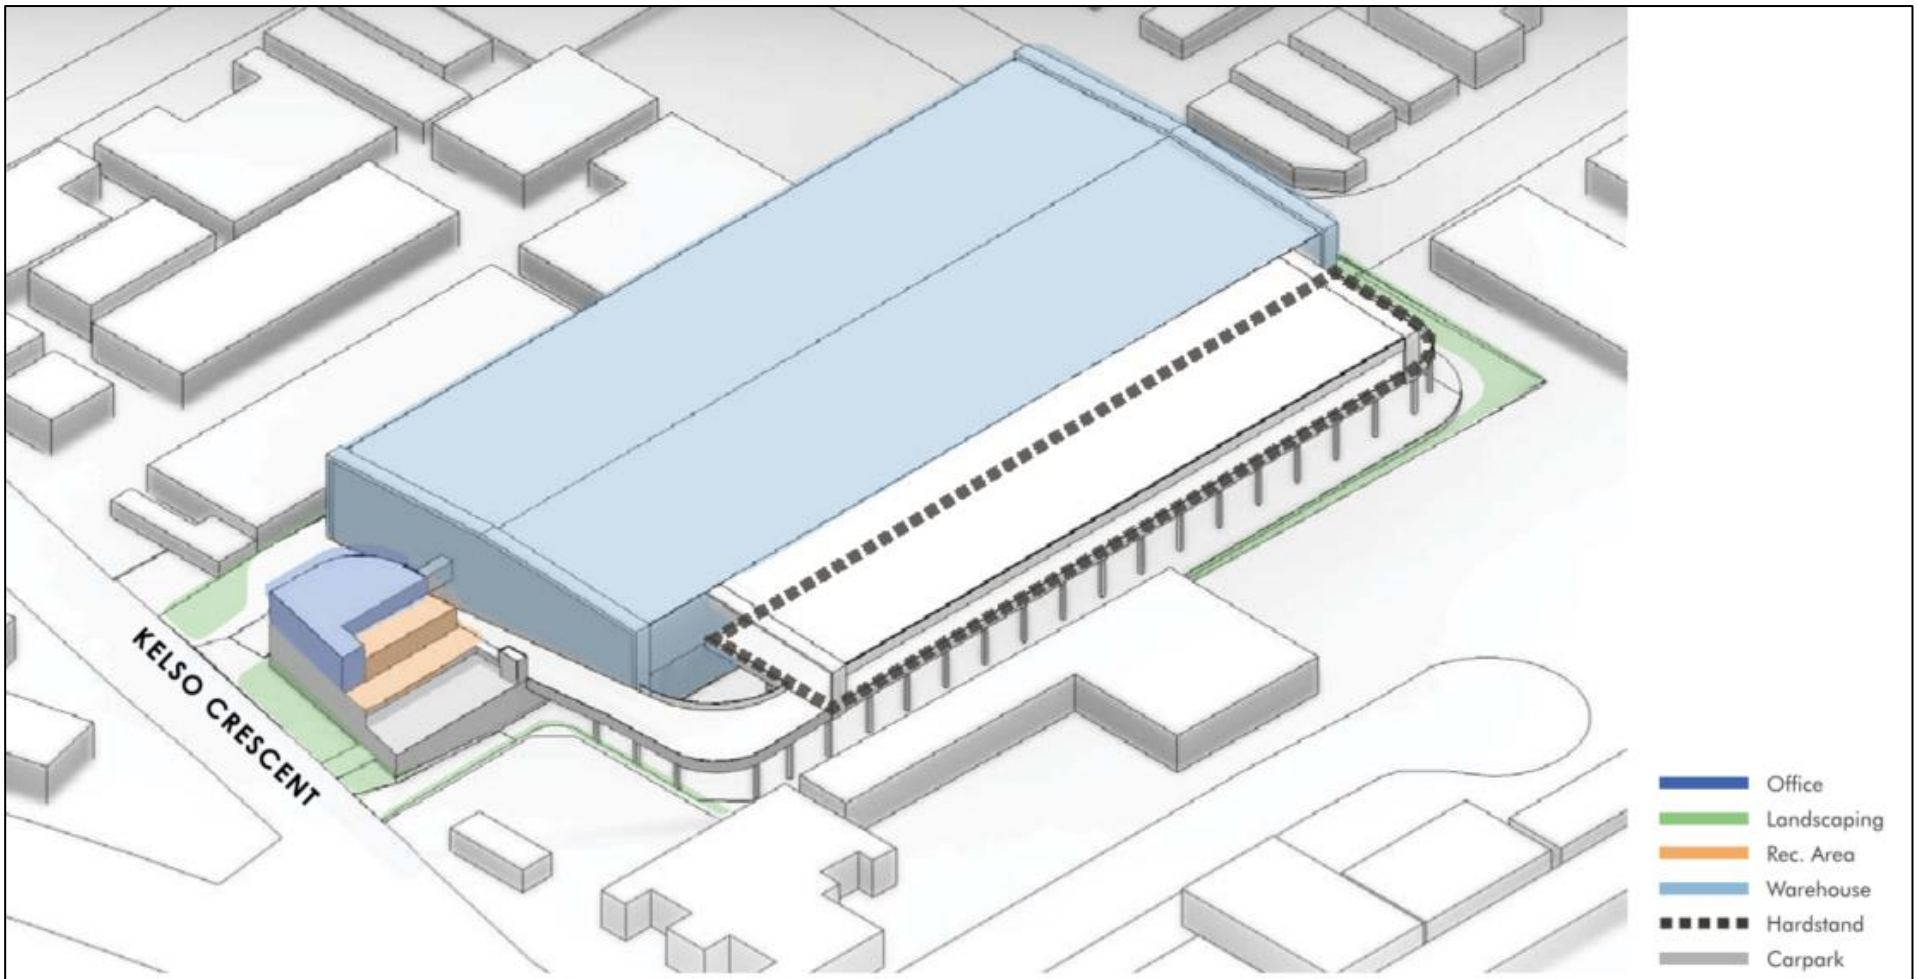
Proposed Building Configuration Drawing (Source: Nettletontribe, 2023)
